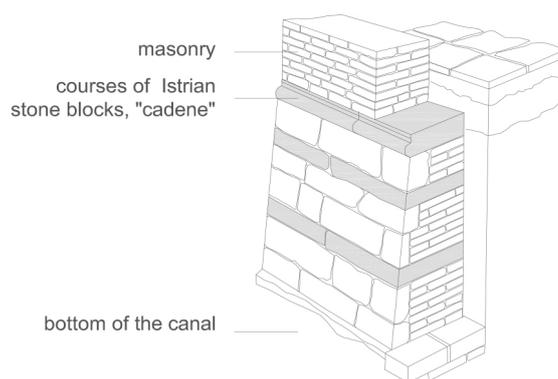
Schematic representation of Venetian masonry foundation detailing the "*cadene*", adapted from [40].
